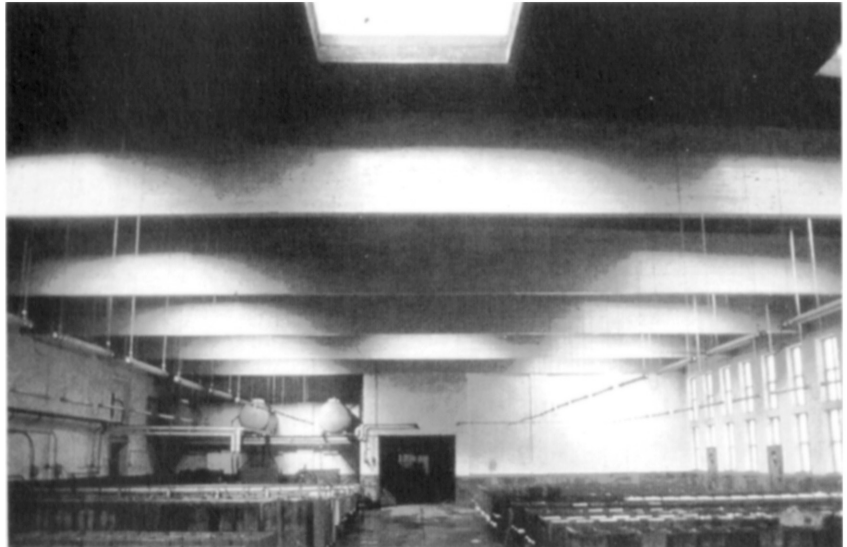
Timber roof structure of a storage battery manufacturing plant.
